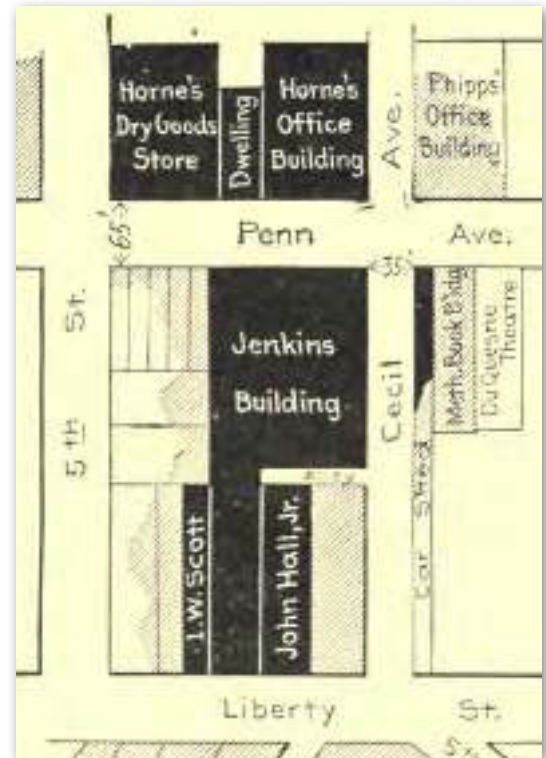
Site plan, showing the extent of the May 1897 fire in black (*The Planning and Construction of High Office-Buildings*).
